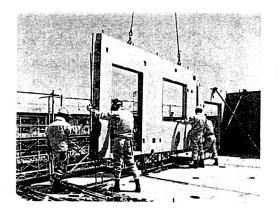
Concrete Prefabricated House (Mishima, 1994)
